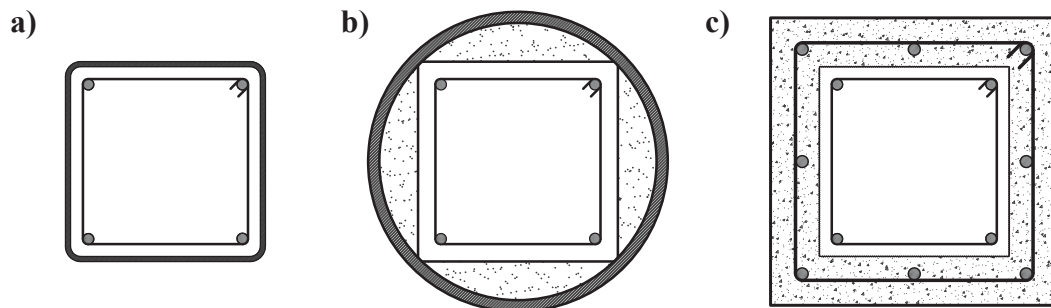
Typical cross-sections of a column retrofitted using (a) FRP; (b) steel jacketing; and (c) RC jacketing
